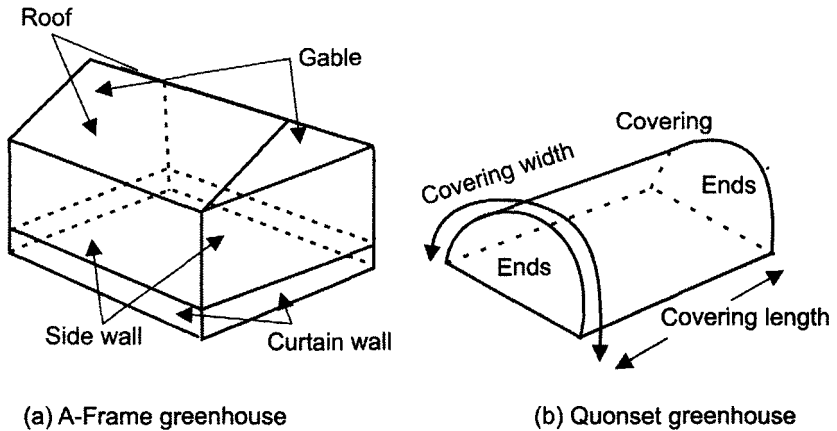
Greenhouse structural components of heat requirement calculations.
